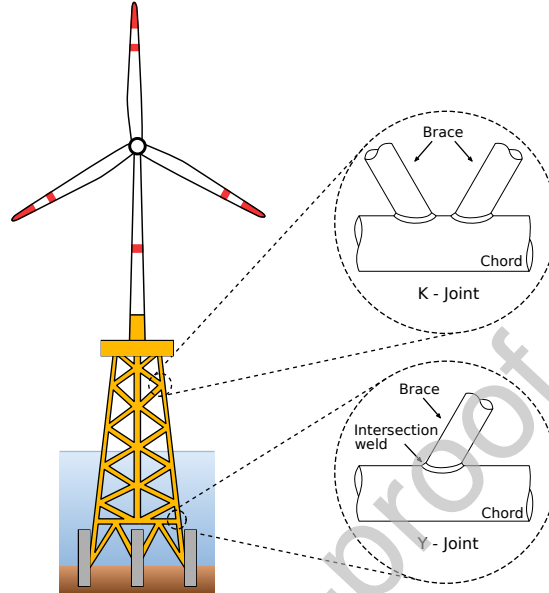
Welded offshore jacket supporting a wind turbine and illustration of two typical configuration of joints between circular hollow sections.
